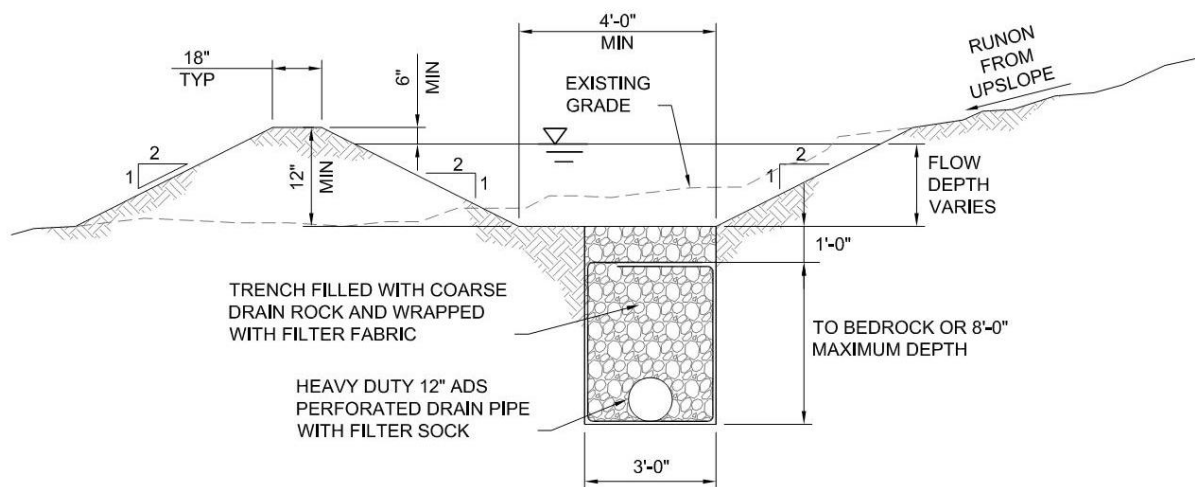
Cross-section for Typical Earthen or Grass-lined Run-on Diversion Ditch
